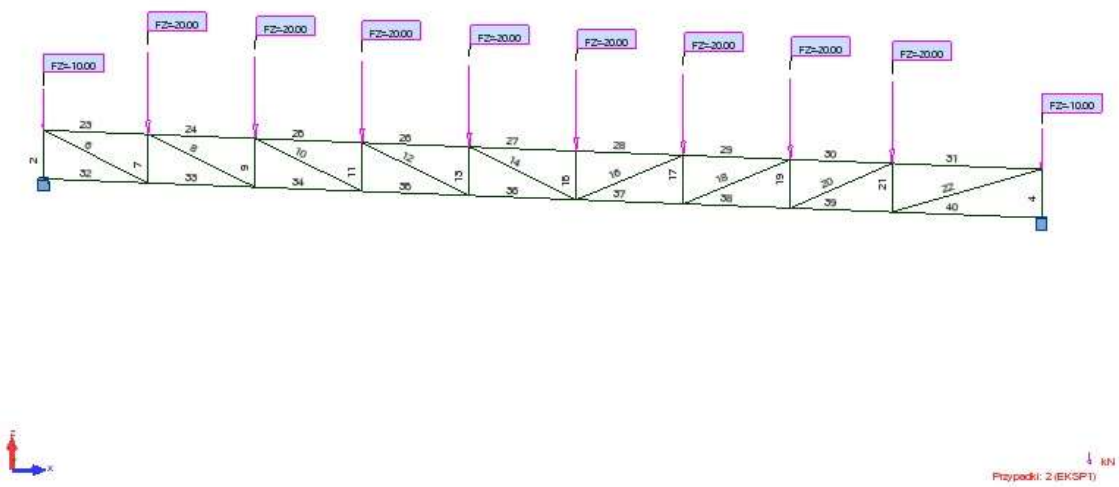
Original truss used in Continente Bom Dia construction.
